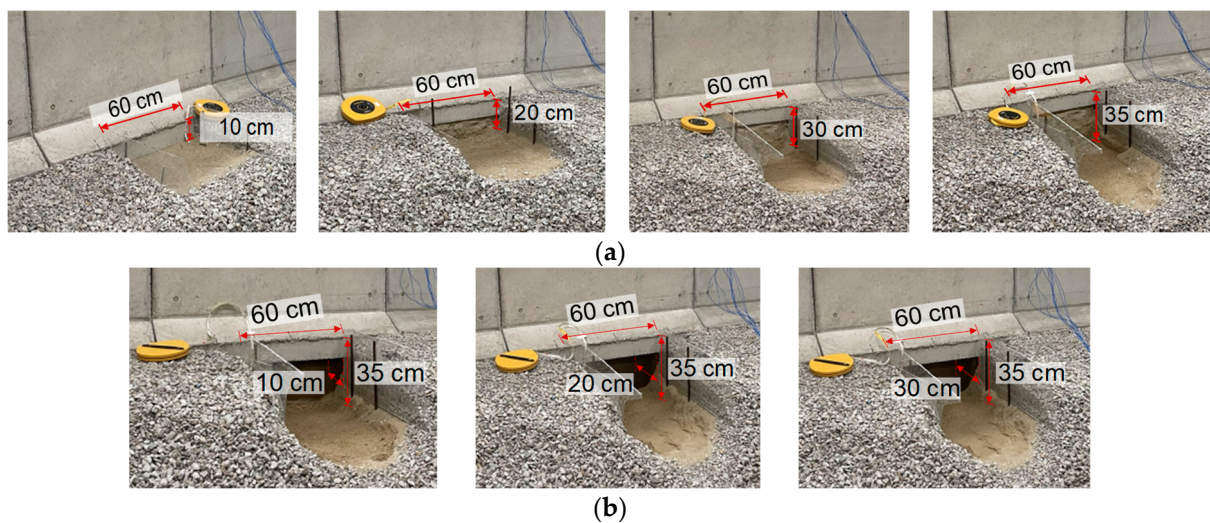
Foundation damage scenarios: (a) Damage 1–Damage 4; (b) Damage 5–Damage 7.
